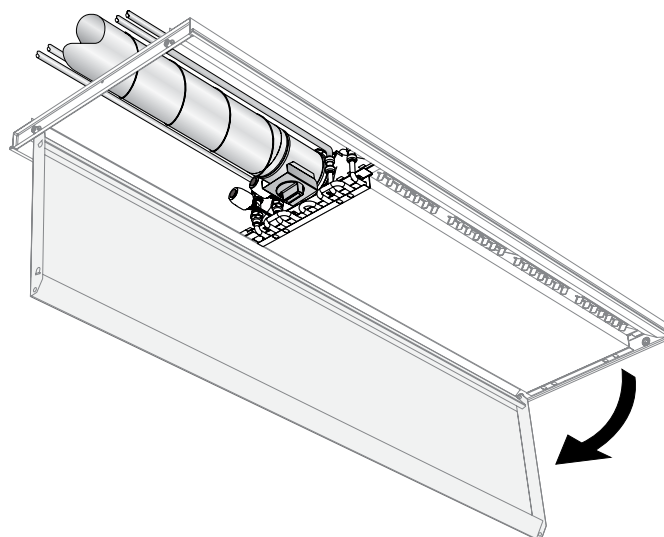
Example showing access to an inactive section with straight horizontal connections when the face plate is open from its hinges.
